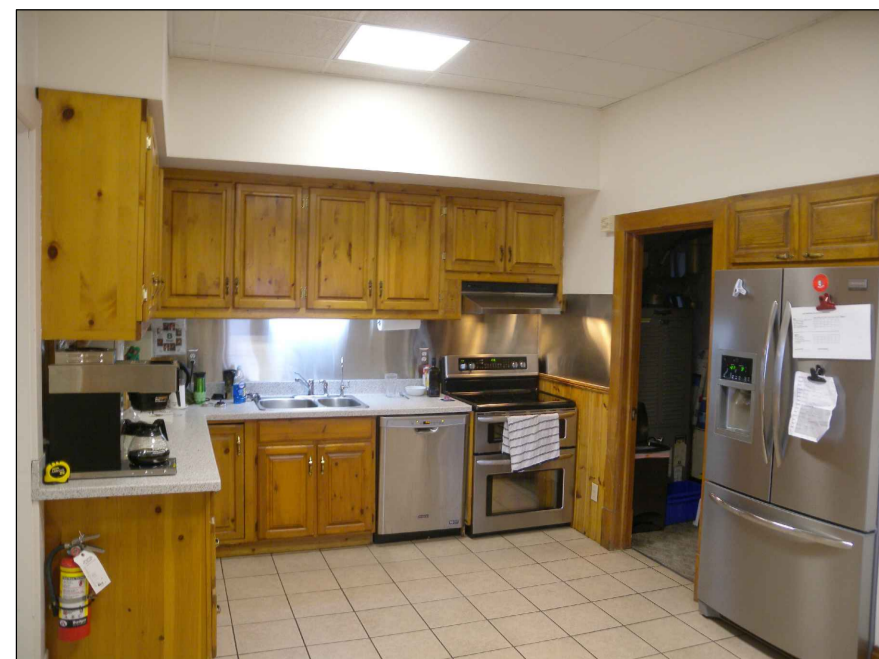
EX. LIGHTHOUSE KEEPER'S DWELLING (HISTORIC BUILDING) KITCHEN
